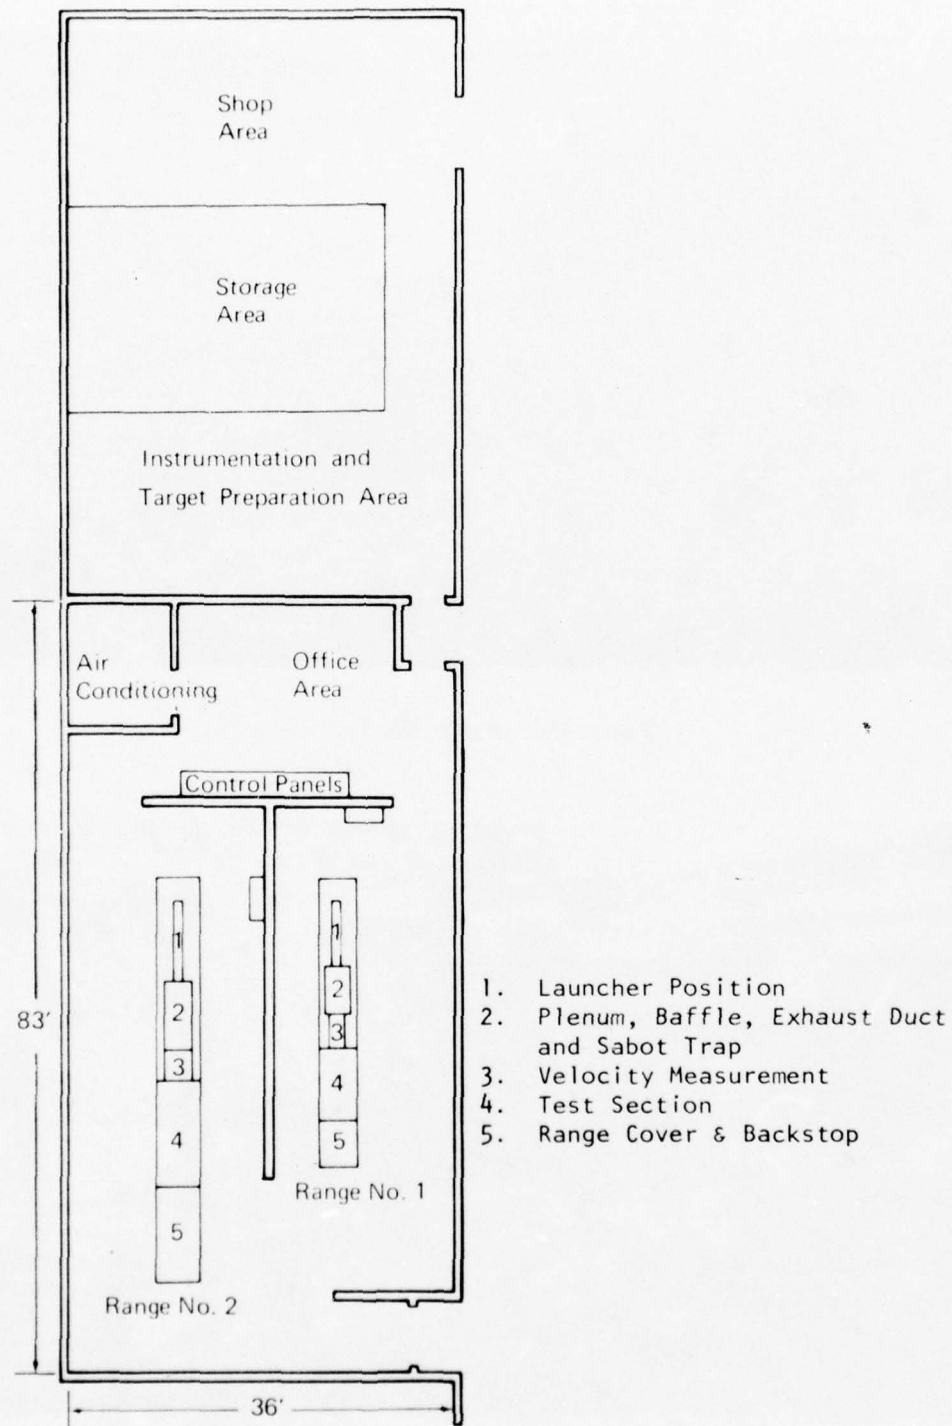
Impact Mechanics Laboratory - Floor Plan.
